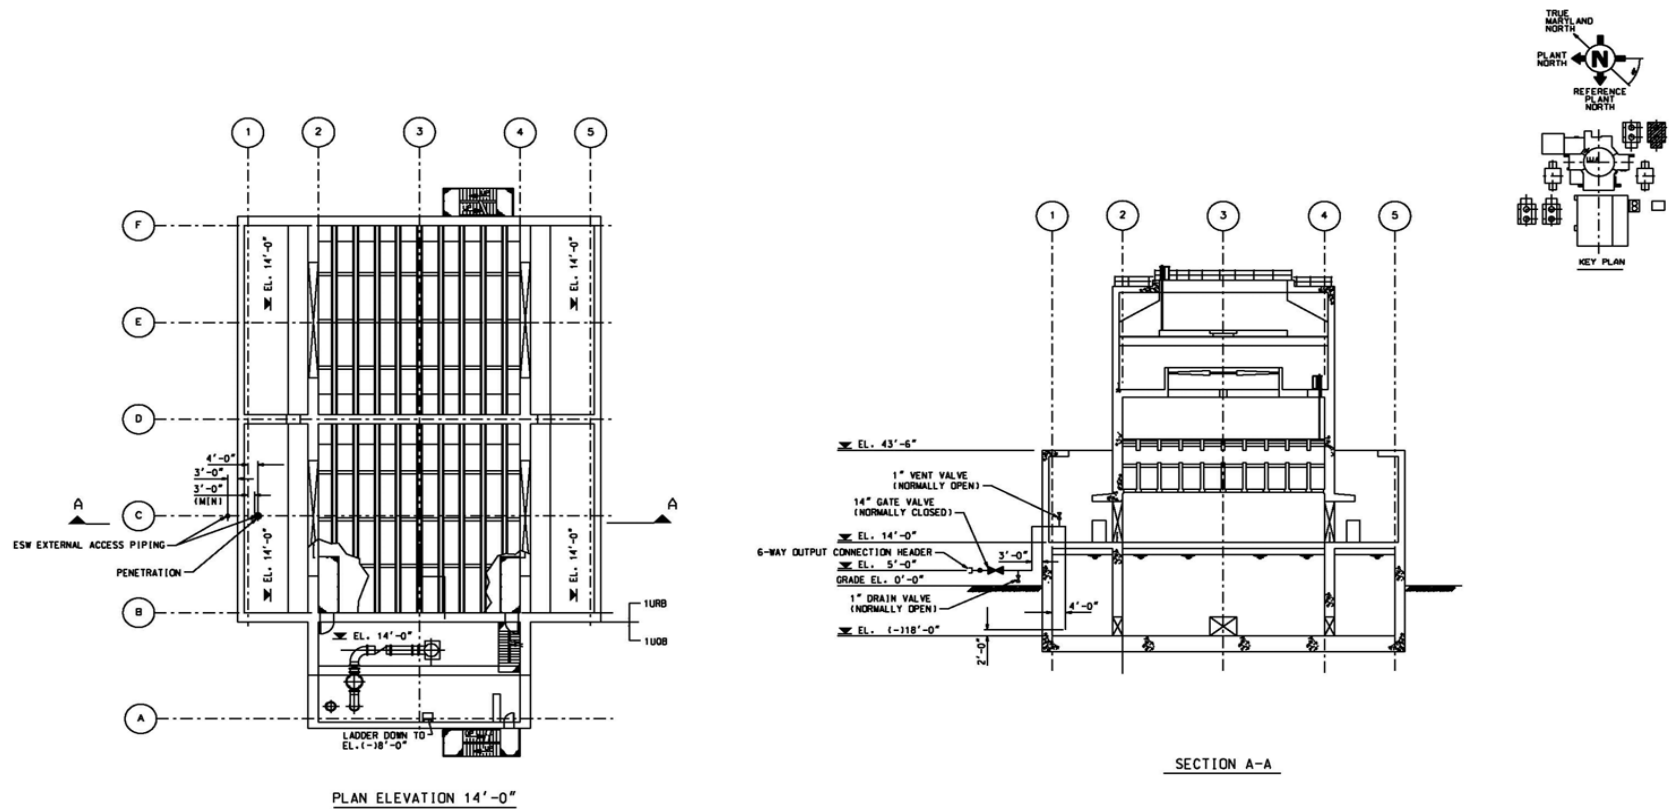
{ESW Basin External Access Piping - Plan View at Elevation 14'0" and Section A-A}
